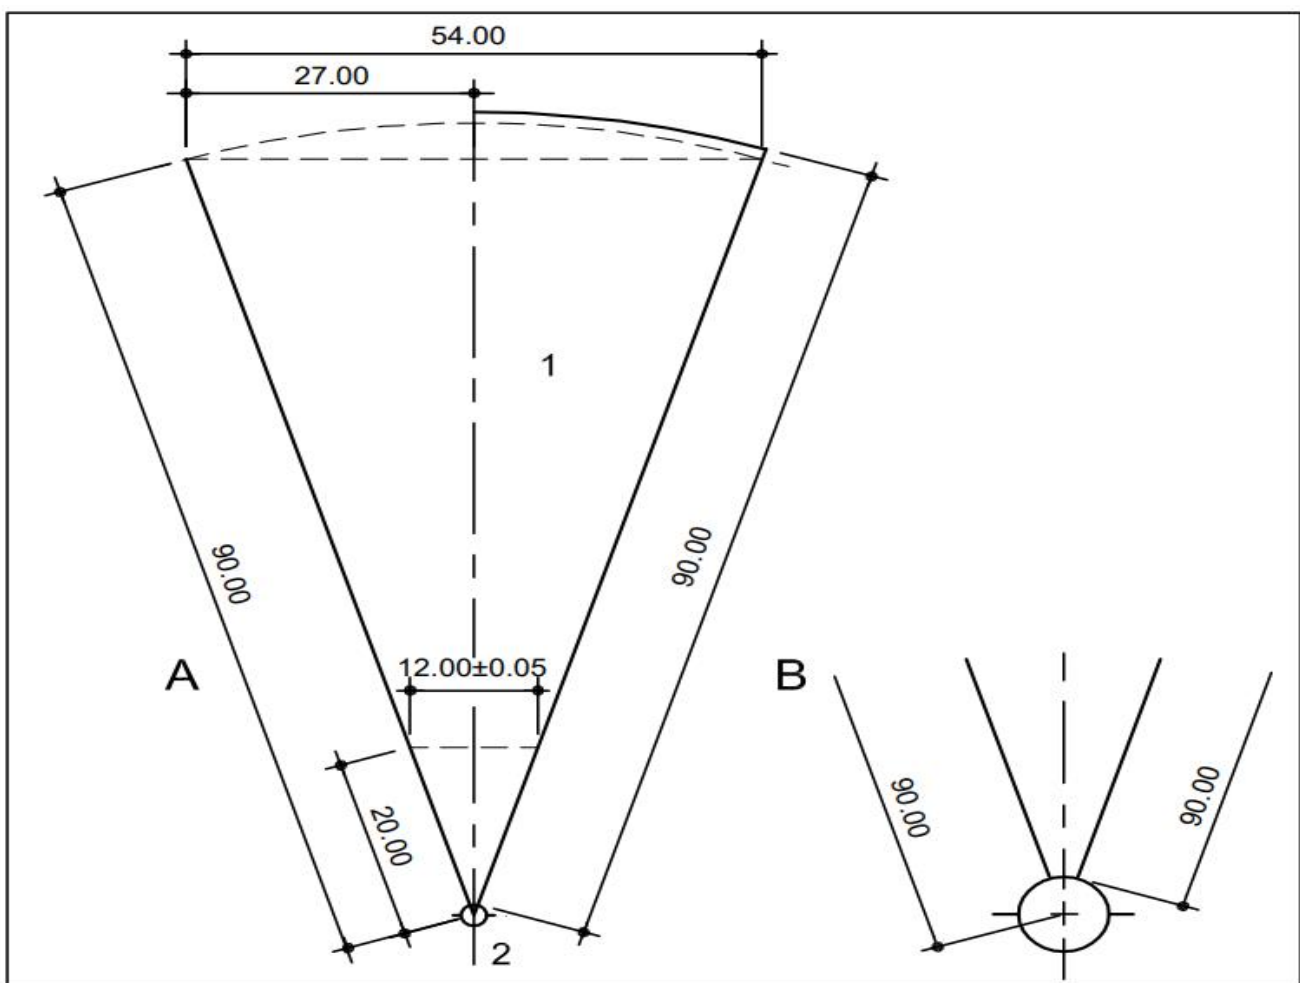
Hammer Throw facility (Dimensions in m)
